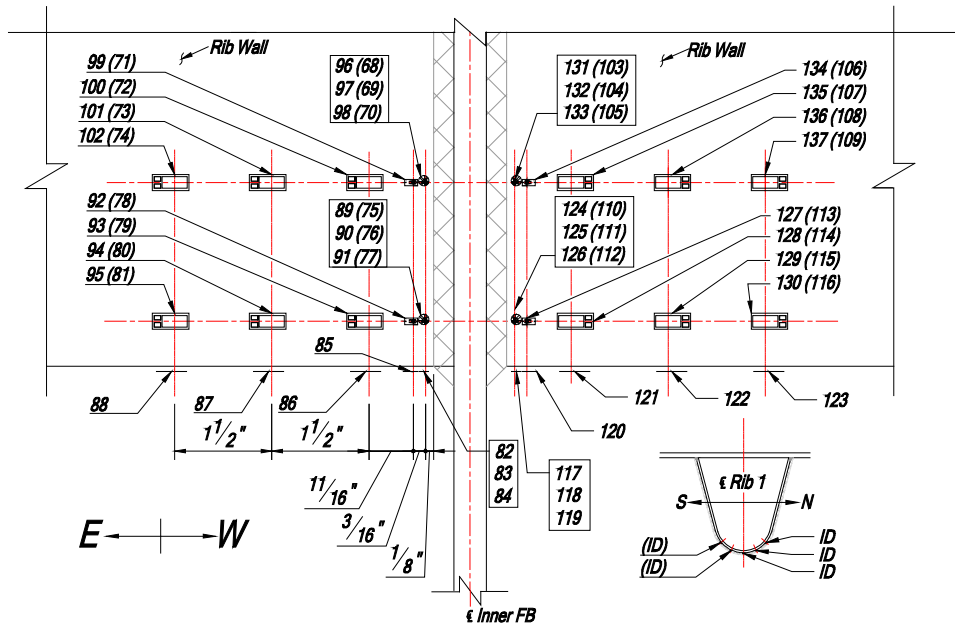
Gauges on north wall of Rib 1 wall at inner FB (gauges on south wall are shown in parenthesis)
